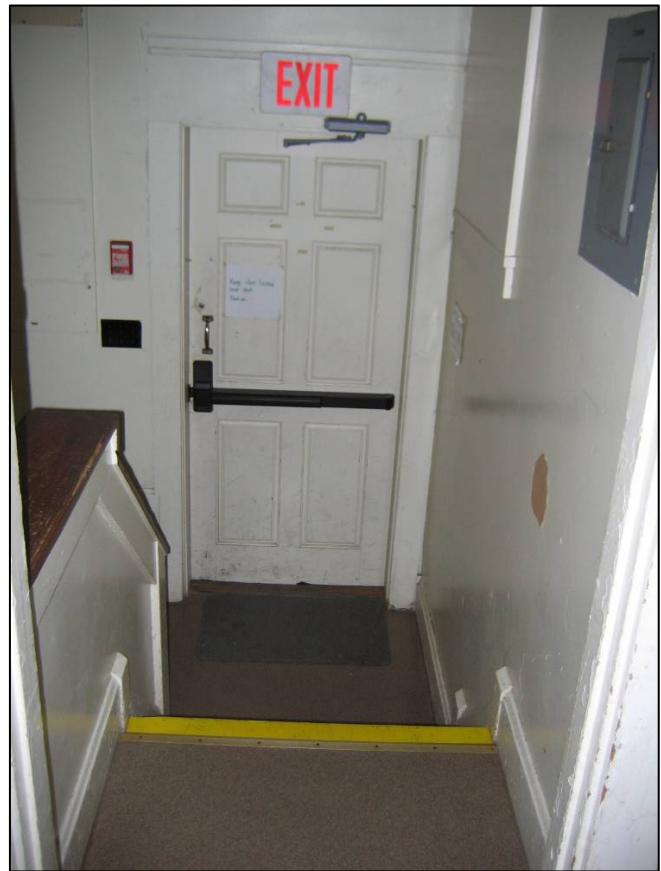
Room 106 (former bedroom), east wall and doorway #1D.
